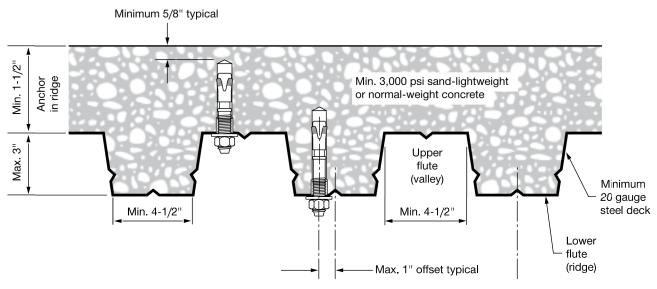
Installation of KWIK Bolt TZ in the soffit of concrete over metal deck floor and roof assemblies - W Deck
